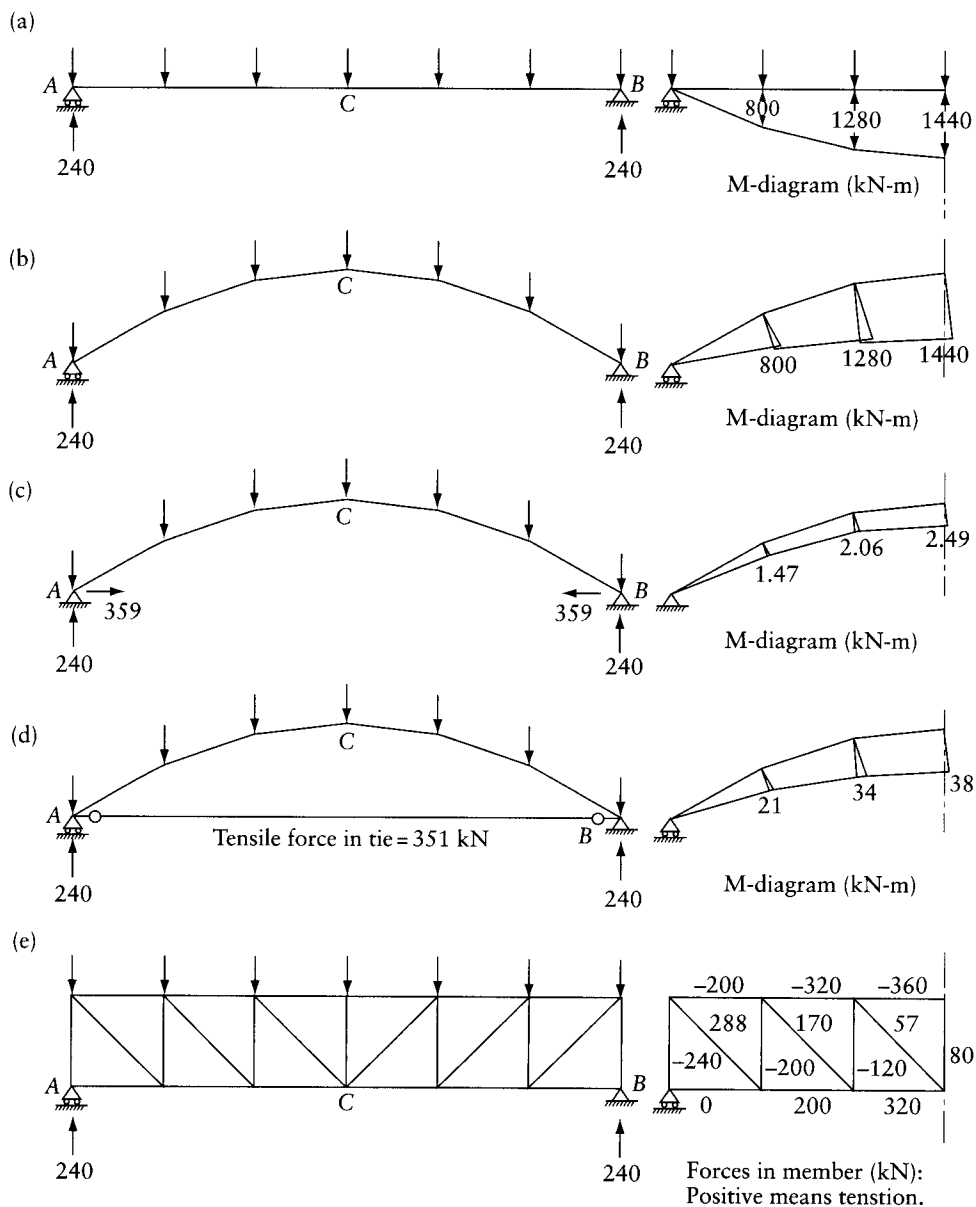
Reactions and internal forces in the structures of Figure 1.24. Total load = 480 kN; span = 24 m. (a) Simple beam. (b) Simply-supported arch. (c) Two-hinged arch. (d) Simply-supported arch with a tie. (e) Truss.
